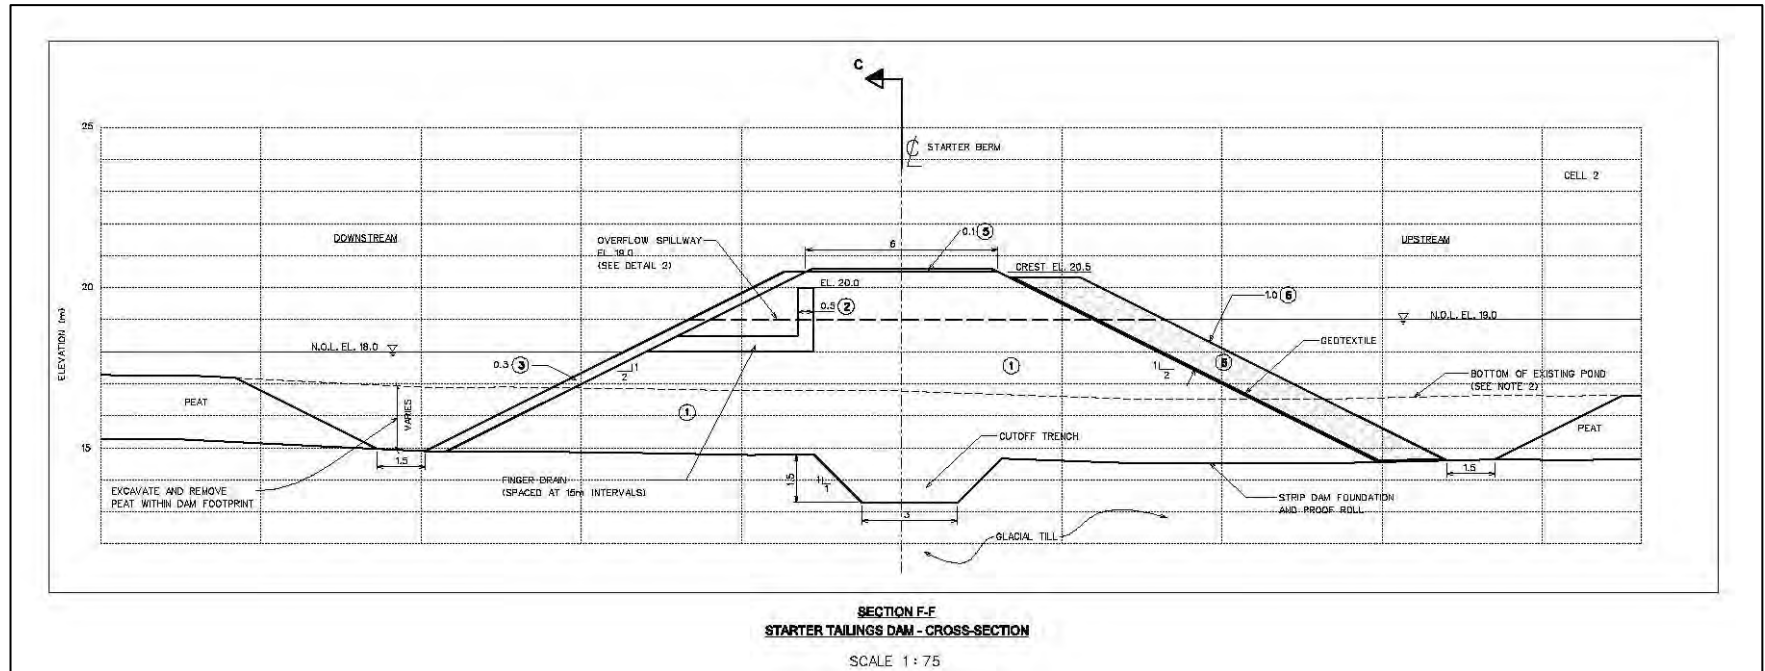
Tailings Management Facility – Dam Cross Section Details
